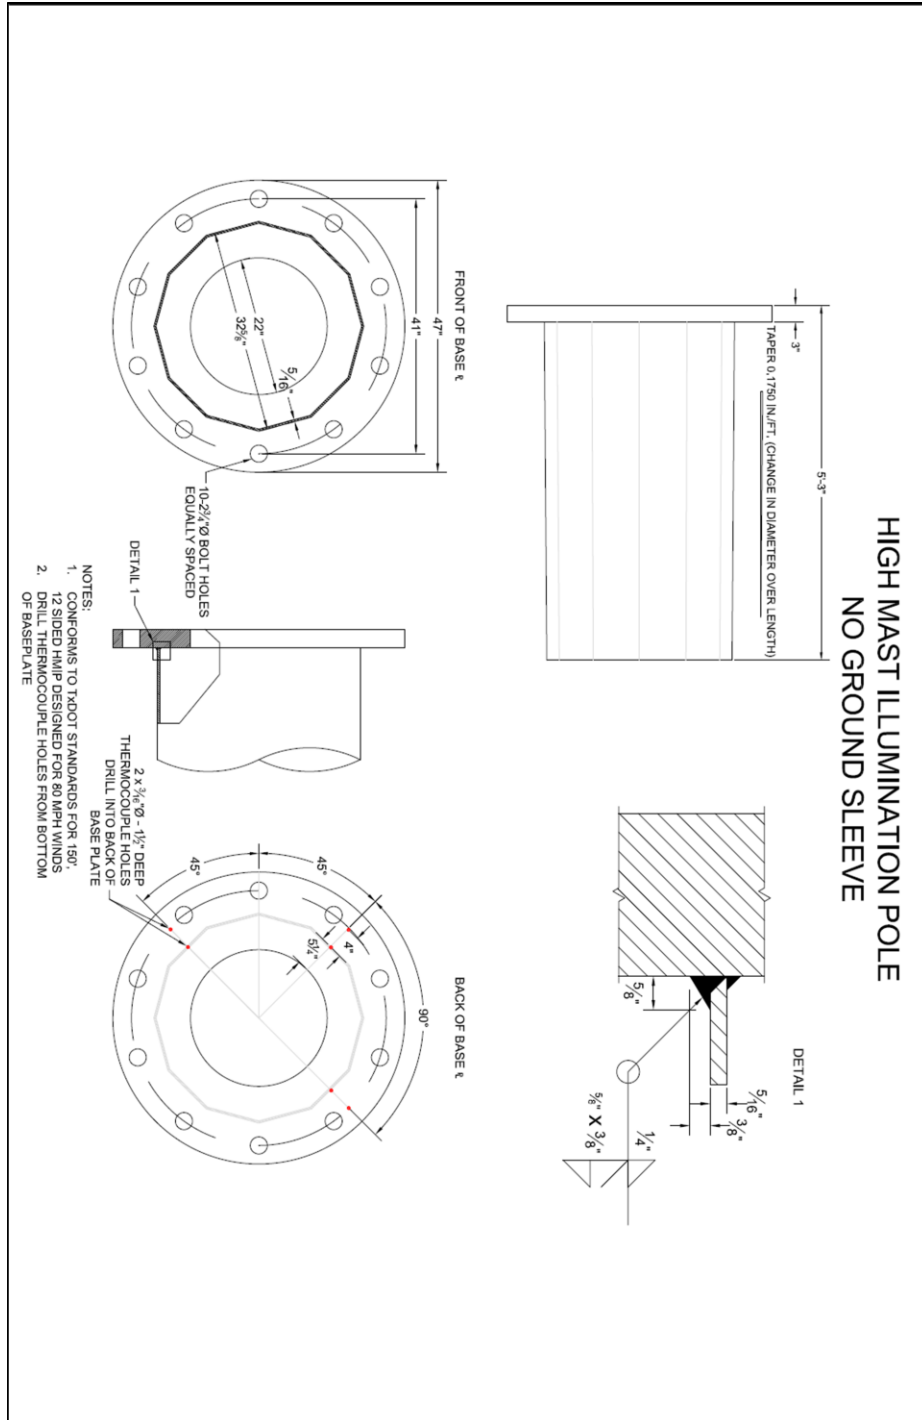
Design drawing for specimen 33-3-12-TX-SG-SB
